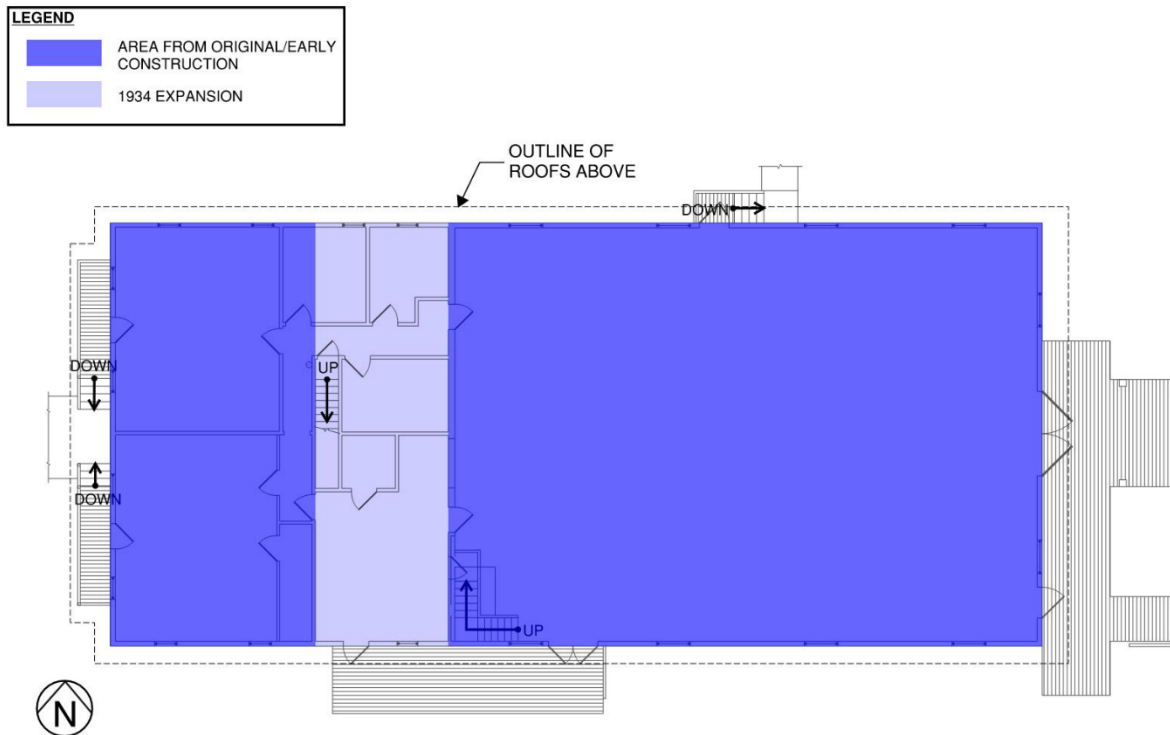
Diagram of the different construction phases of Chautauqua Hall overlaid onto the current first floor layout.
